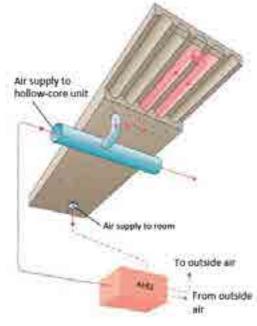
ThermoDeck floor slab diagram (Hartman, 2008)
